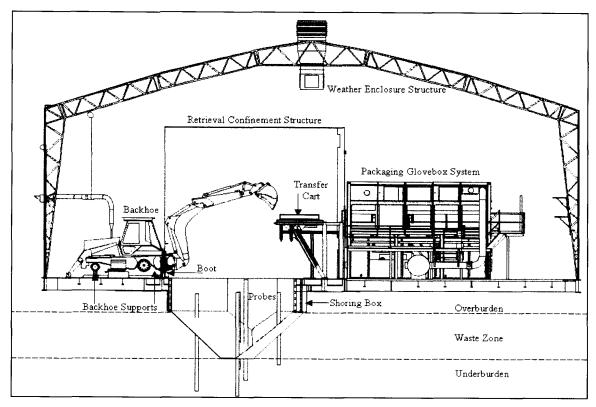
Cross section of the Glovebox Excavator Method Project facility.
